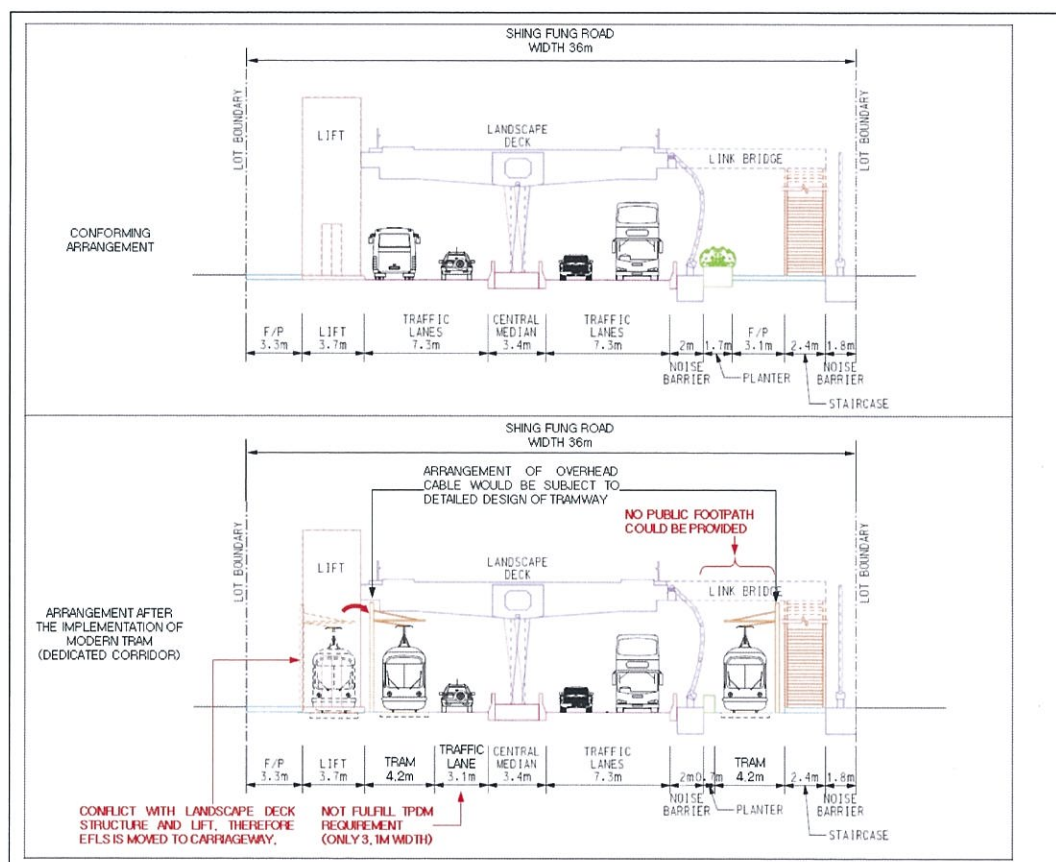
Typical Cross Section Plan of Option 4 – Shing Fung Road (Before and After Implementation)
